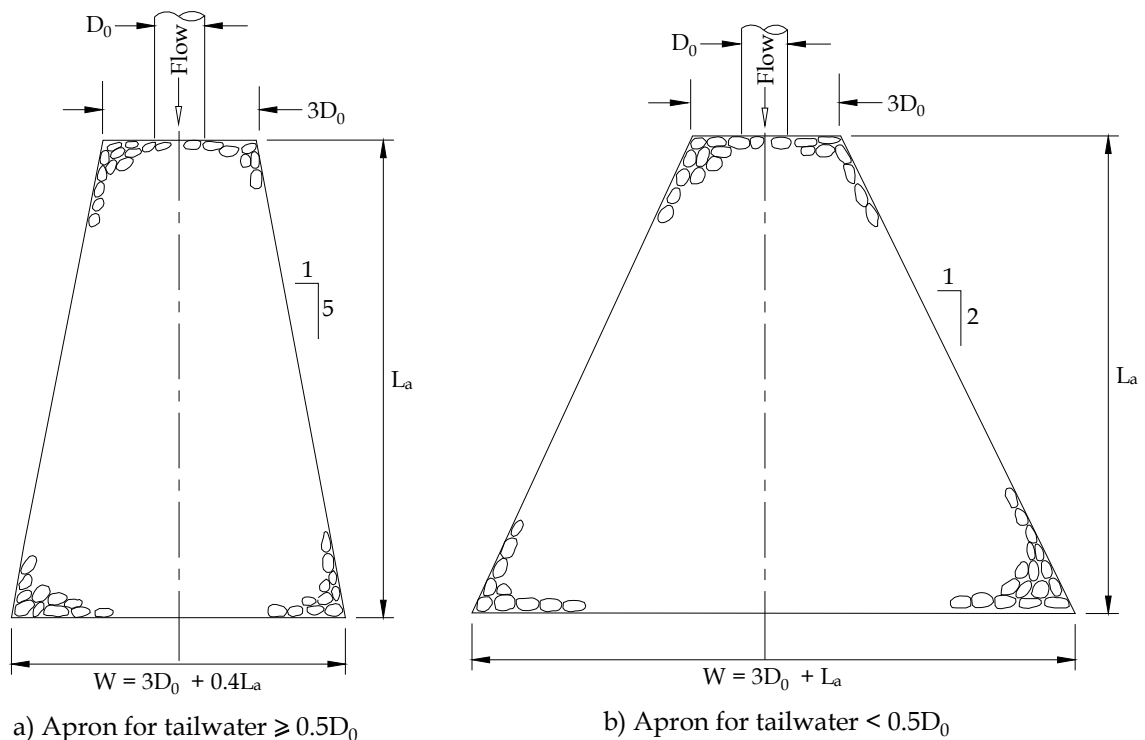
Configuration of Conduit Outlet Protection (U.S. EPA, 1976)
